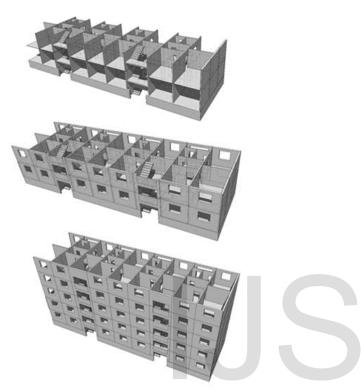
Construction diagram of buildings with continuous structure and load-bearing panels [10]
